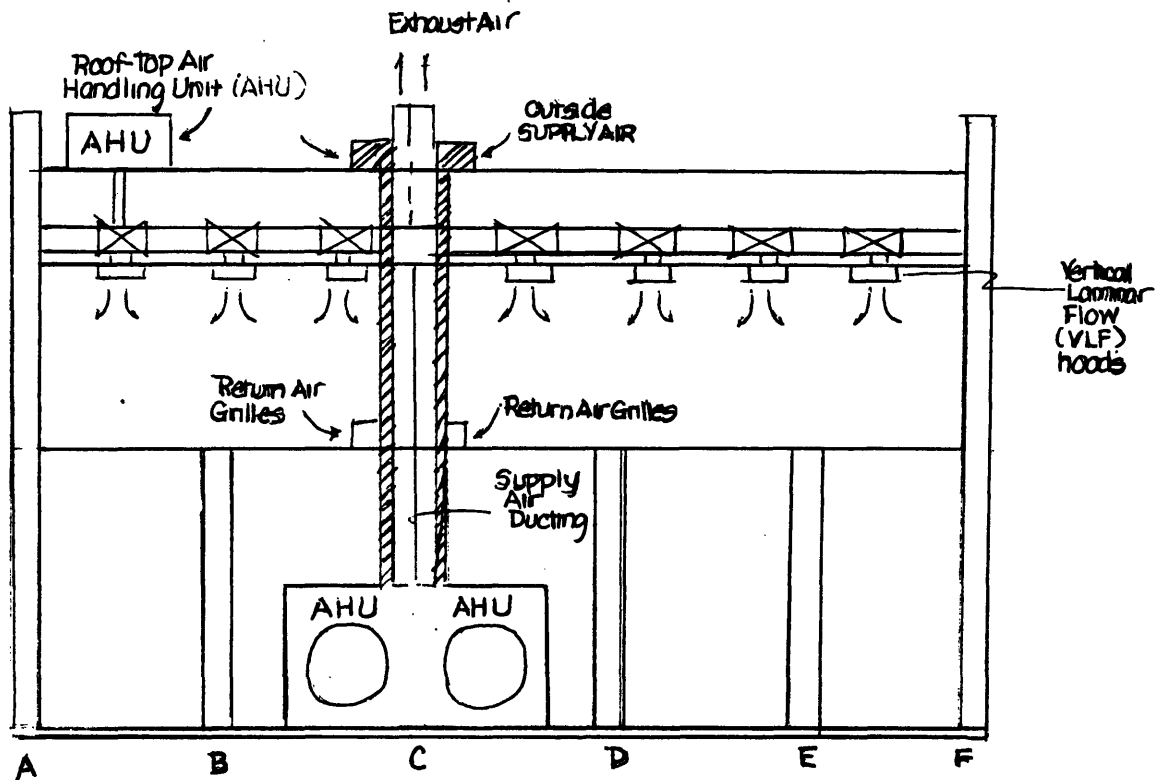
Fab 4 Heating, Ventilation, and Air Conditioning Perspective
